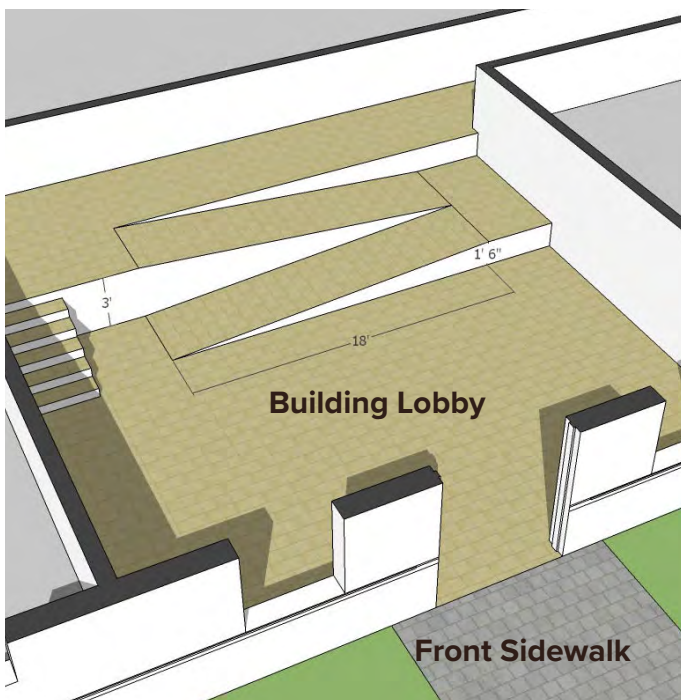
Elevated first finished floor accessed by interior ramp.
